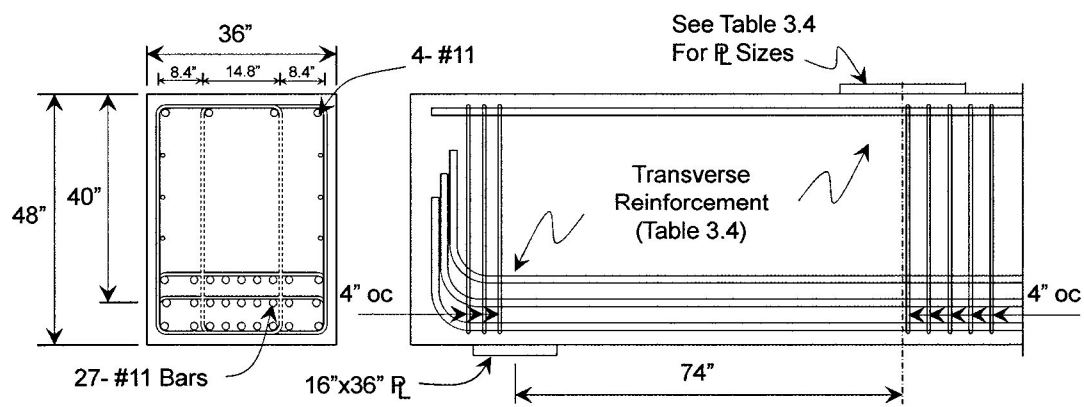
Detailing deep beams of series M (Birrcher 2006)
